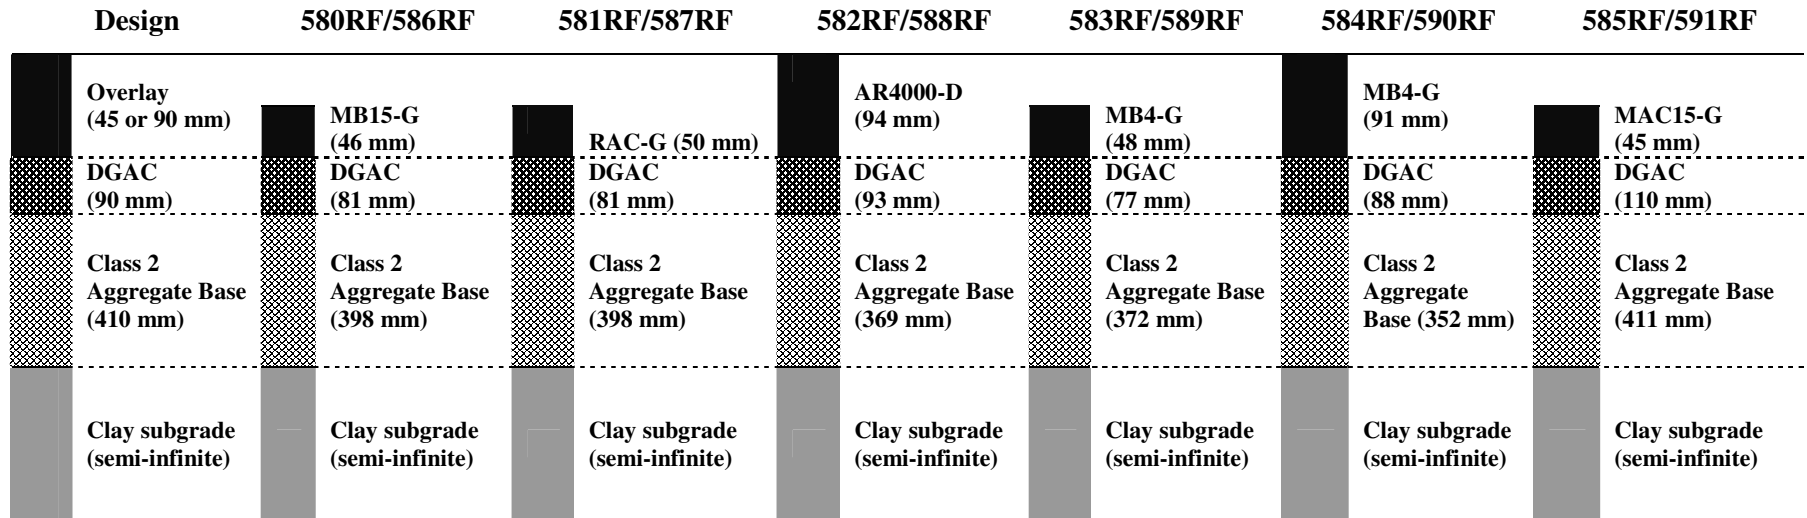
Pavement design for reflective cracking experiment (design and actual).
